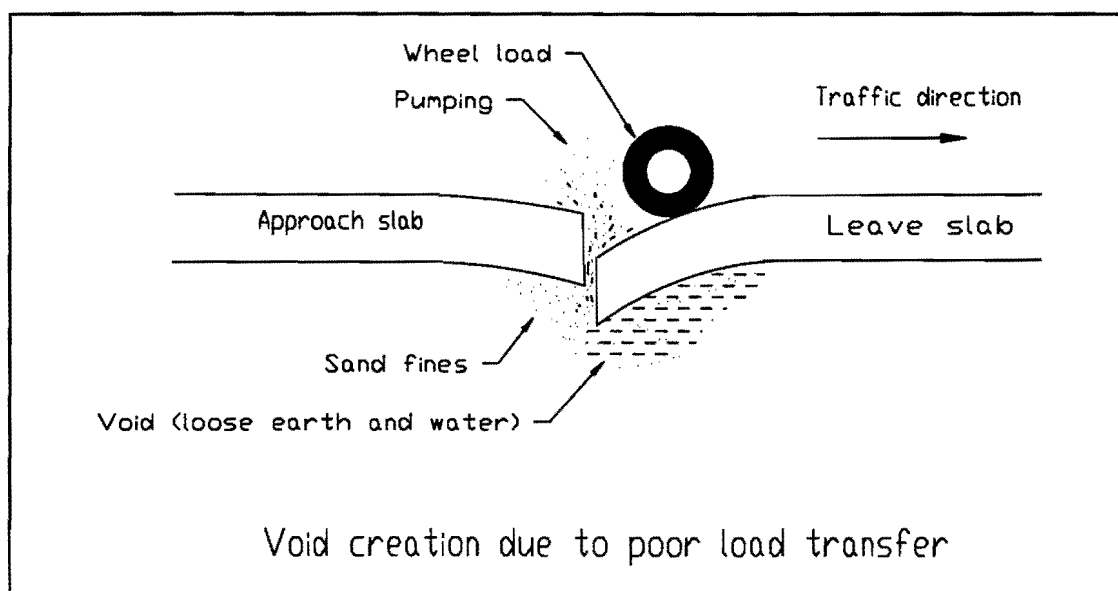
Schematic Describing the Creation of Voids under Jointed Concrete Pavement.
